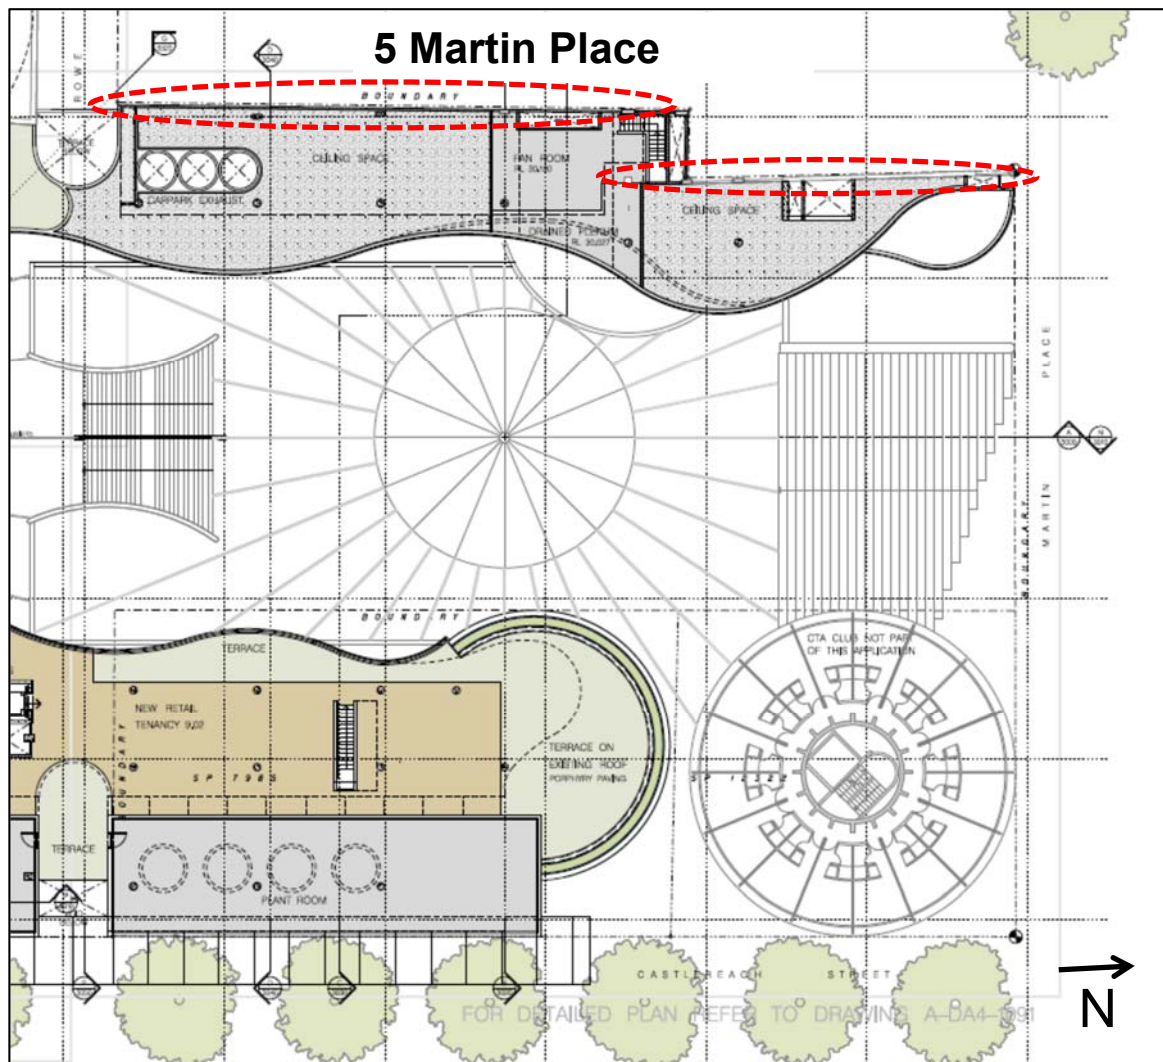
Level 9 floor plan illustrating location of new podium plant in relation to 5 Martin Place
